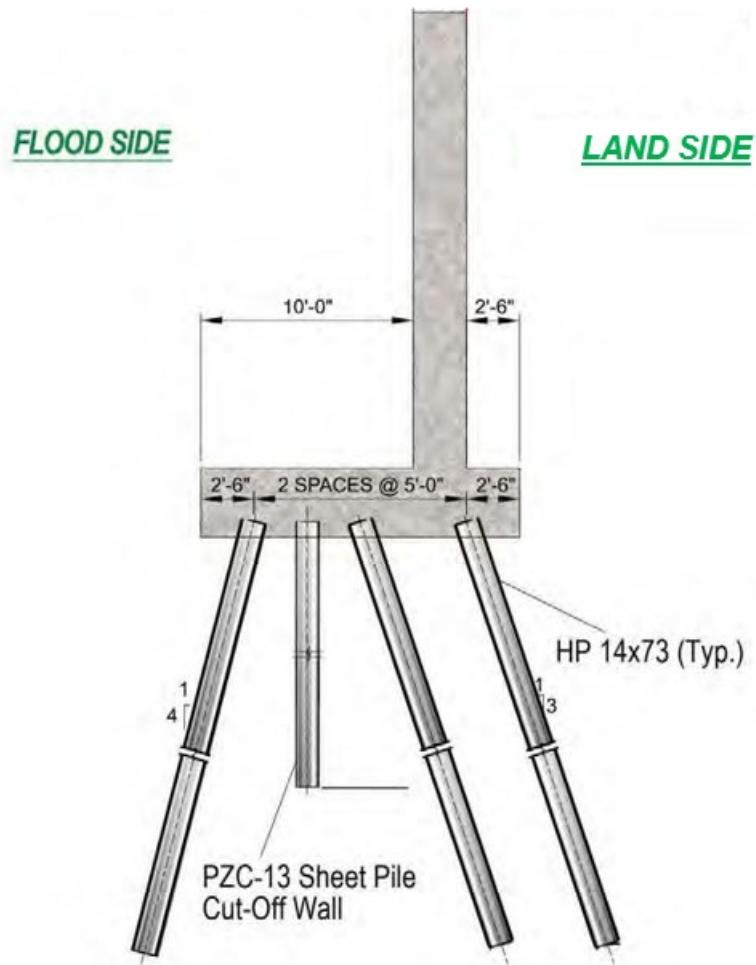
Typical Section of Fronting Protection Wall @ Pump
